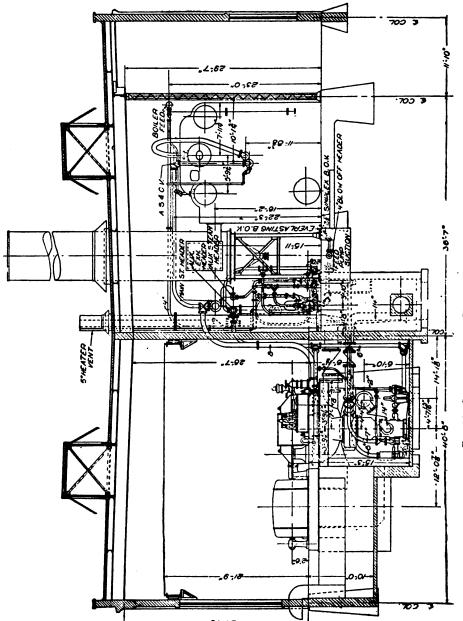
SECTION THROUGH ENGINE- AND BOILER-ROOM,
